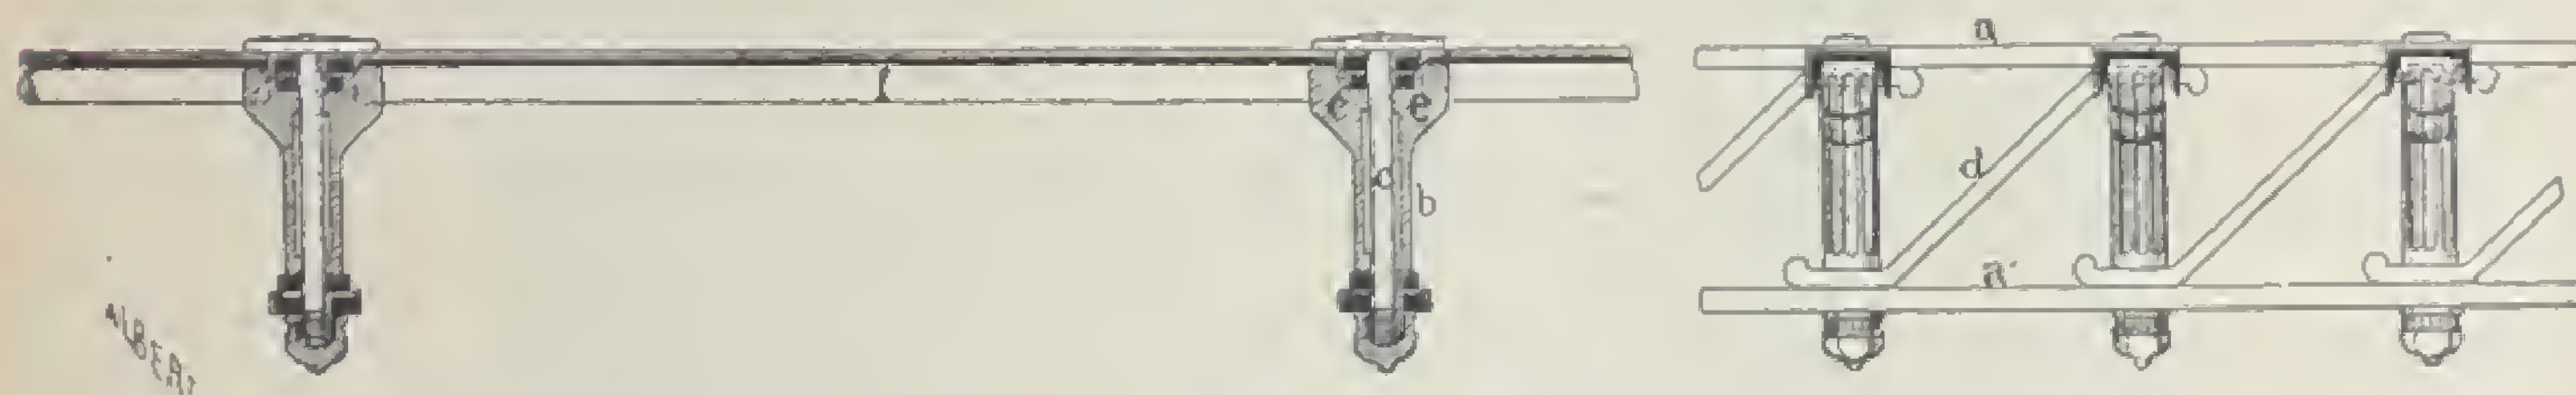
Substructure of ceilings, roofs, bridges &c.
